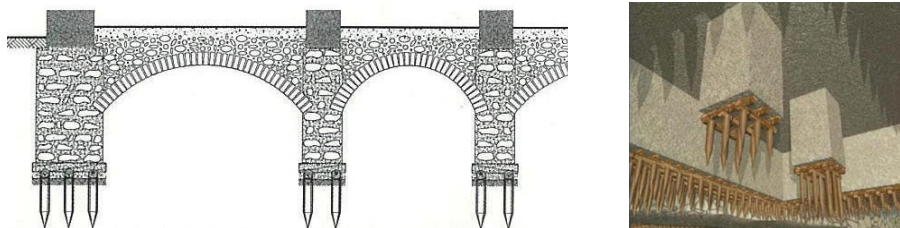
Foundation system made of masonry arches and caissons supported in timber piles (Silva, 2007).
